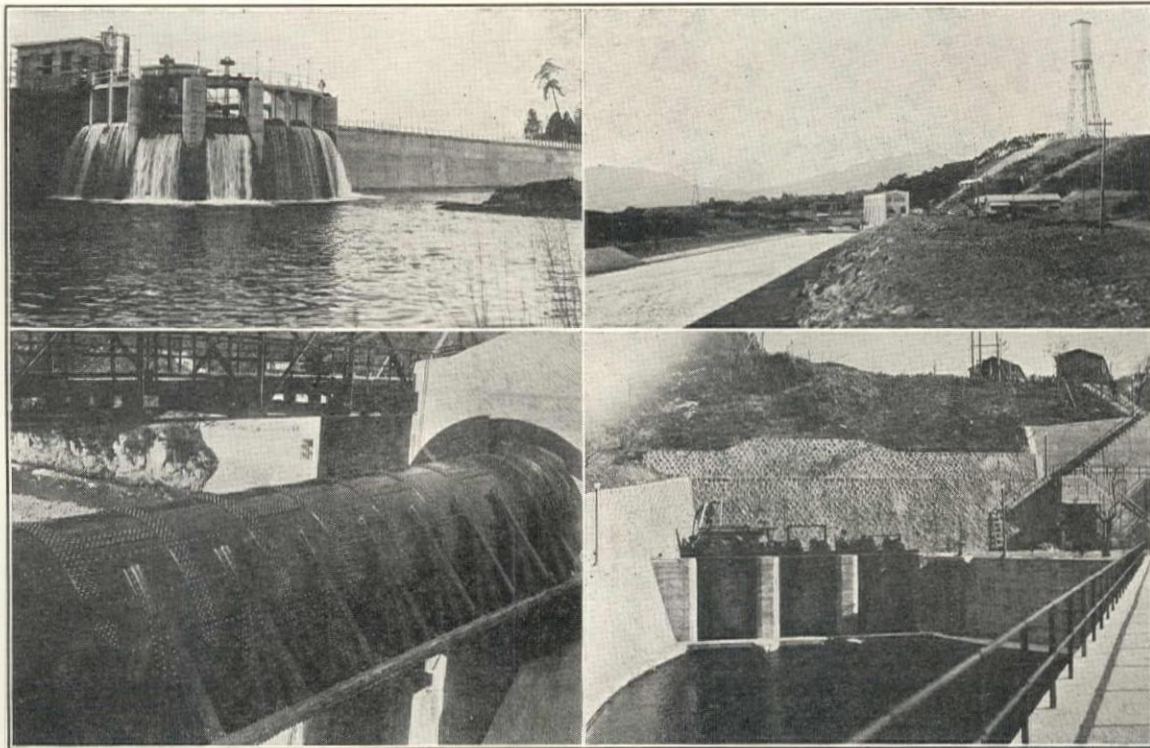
(UPPER LEFT) INTAKE TOWER FOR PRESSURE CONDUIT FROM REGULATING RESERVOIR. (UPPER RIGHT) TAIL-RACE, POWERHOUSE, SWITCHING STATION, PENSTOCK LINE, AND DIFFERENTIAL SURGE TANK. (LOWER LEFT) HOISTED VIEW OF ROLLER GATE ON DIVERSION DAM AT INTAKE SHOWING WATER SHIELD. (LOWER RIGHT) INSIDE OF INLET STRUCTURE SHOWING GATES AT TUNNEL ENTRANCE
